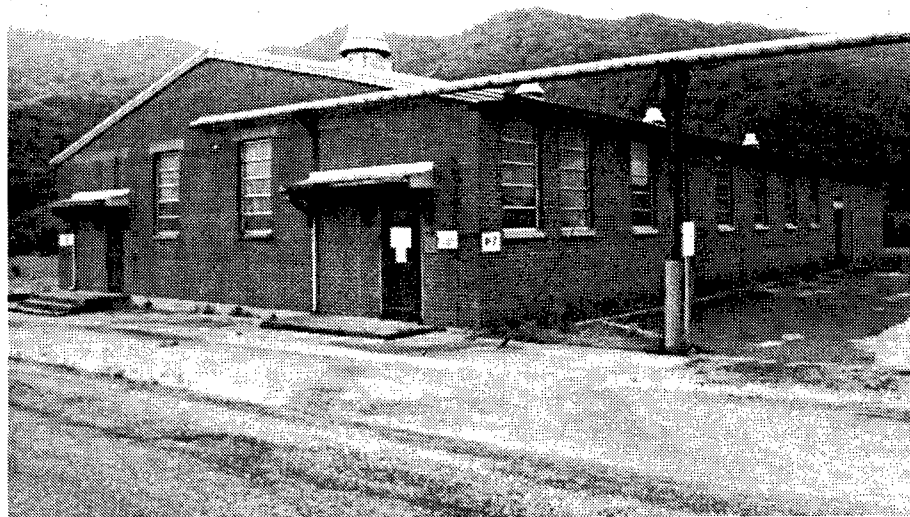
Building P7: Change House. Note bricked-in transoms and doors.
